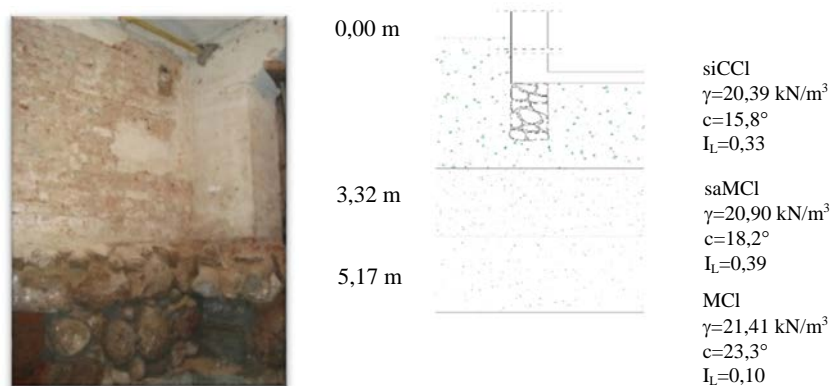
Cross-section of foundation of historical building at Staromiejska Street in Olsztyn (Poland) together with geotechnical profile.
